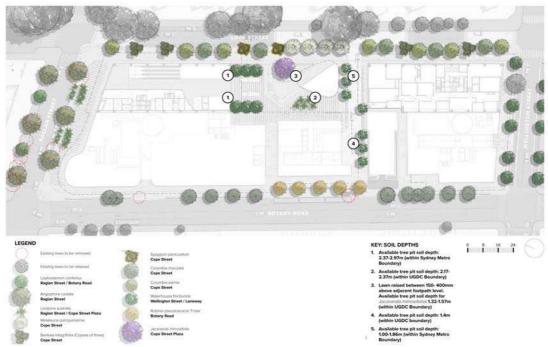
Plan of the proposed tree planting around the Waterloo Metro Quarter (Source: Turf Design – July 2018)
